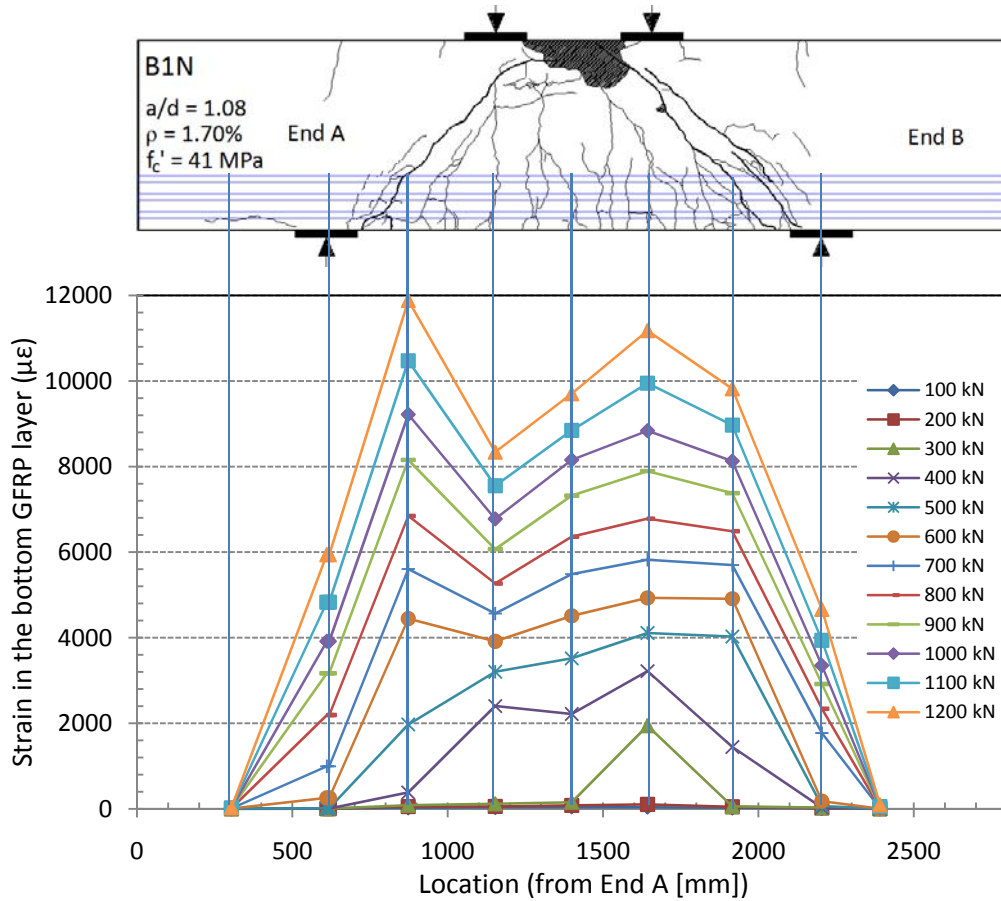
Typical reinforcement strain distribution along the bottom layer of reinforcement as the load increased (specimen B1N shown).
